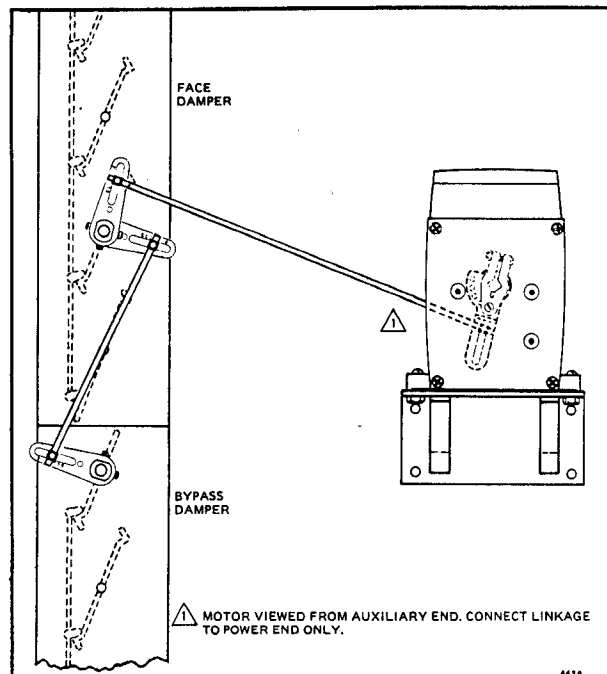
MODUTROL MOTOR MOUNTED EXTERNALLY TO OPERATE A NORMALLY CLOSED FACE DAMPER AND A NORMALLY OPEN BYPASS DAMPER.
